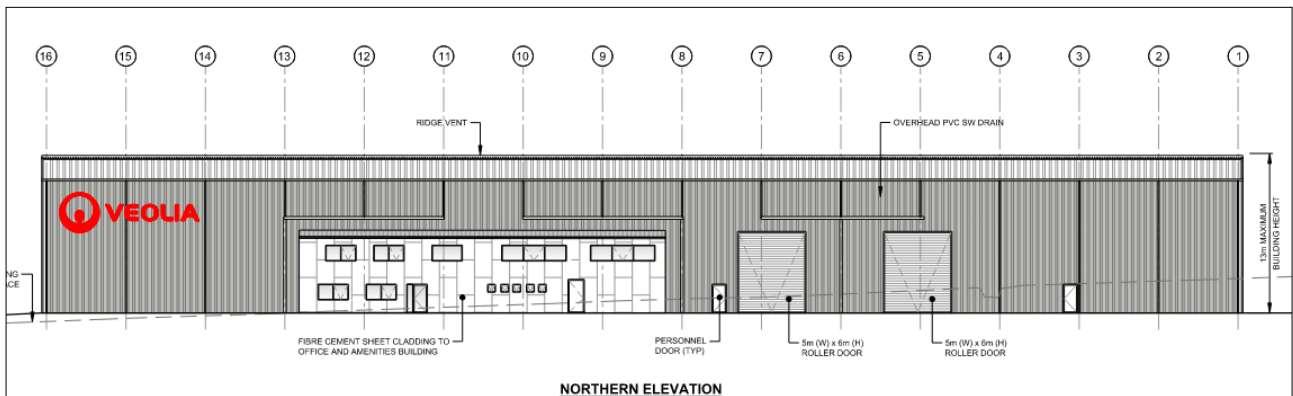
Northern elevation (Tasmanian Consulting Service, 2022)
